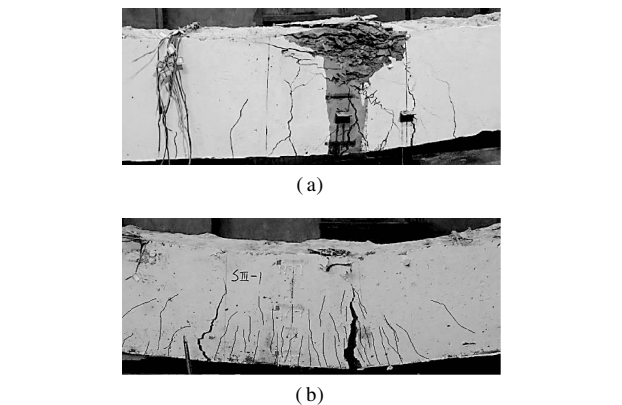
Failure modes and crack patterns. (a) RC beam; (b) R/ECC beam
